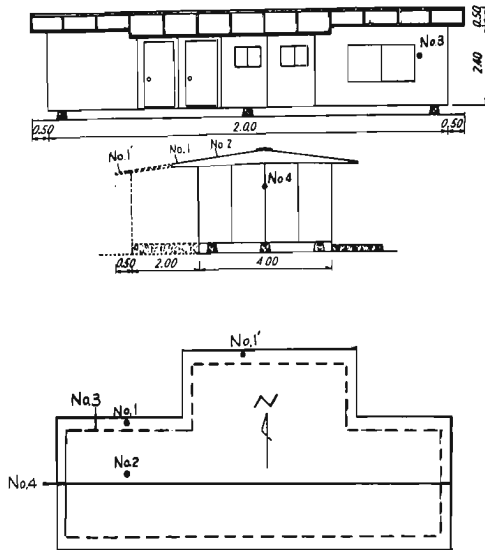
(a) The dimension of actual House A and the position of wind pressure measuring points.
